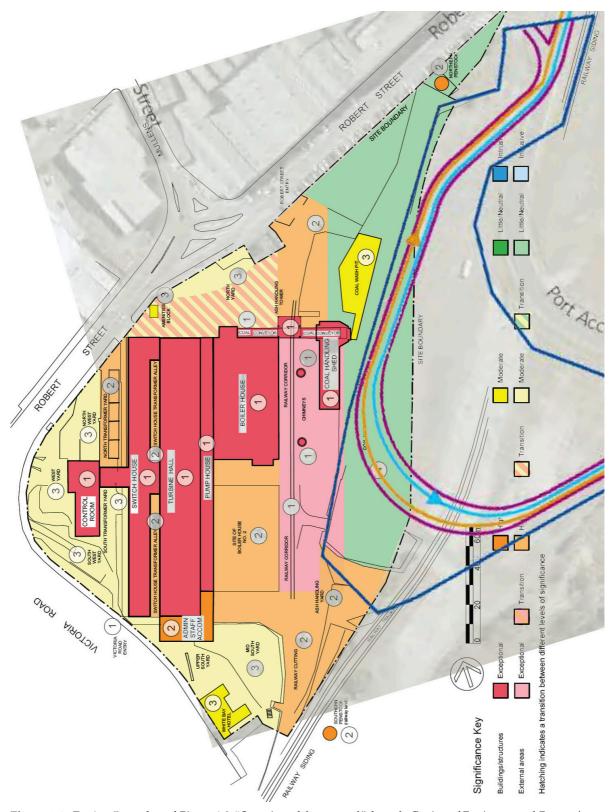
Design 5 overlay of <u>Figure 4-2 "Overview of the proposal"</u> from the Review of Environmental Factors (page 22) with <u>Figure 3.8.2.1 Site Plan Significance Gradings</u> in the White Bay Power Station Conservation Management Plan (page 88). The overlay shows the proposal of the Bays Road to be located predominately east of the Coal Handling Shed and within an area graded as having Little/Neutral significance (shown green). The road will be located close to the railway corridor which formerly serviced the Coal Handling Shed (accessed from the former Rozelle Railyards through the Victoria Road Bridge), and includes the former rail corridor and retaining wall and indicated as having Exceptional Significance.
